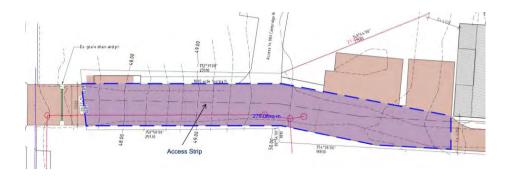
Access strip for the purposes of calculating site area per dwelling.
